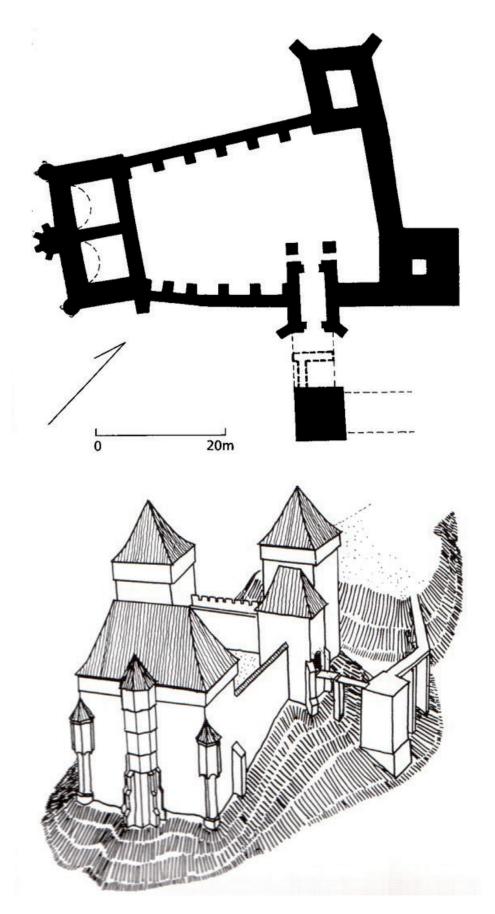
Pińczów, a medieval castle, plan and an attempt at reconstruction. J. Salm.
